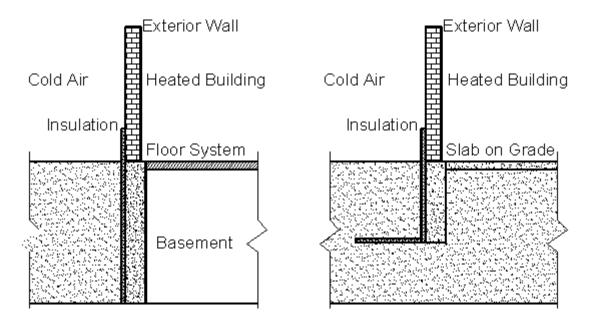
Building Insulation & Shallower Foundations Utilizing EPS Geofoam
